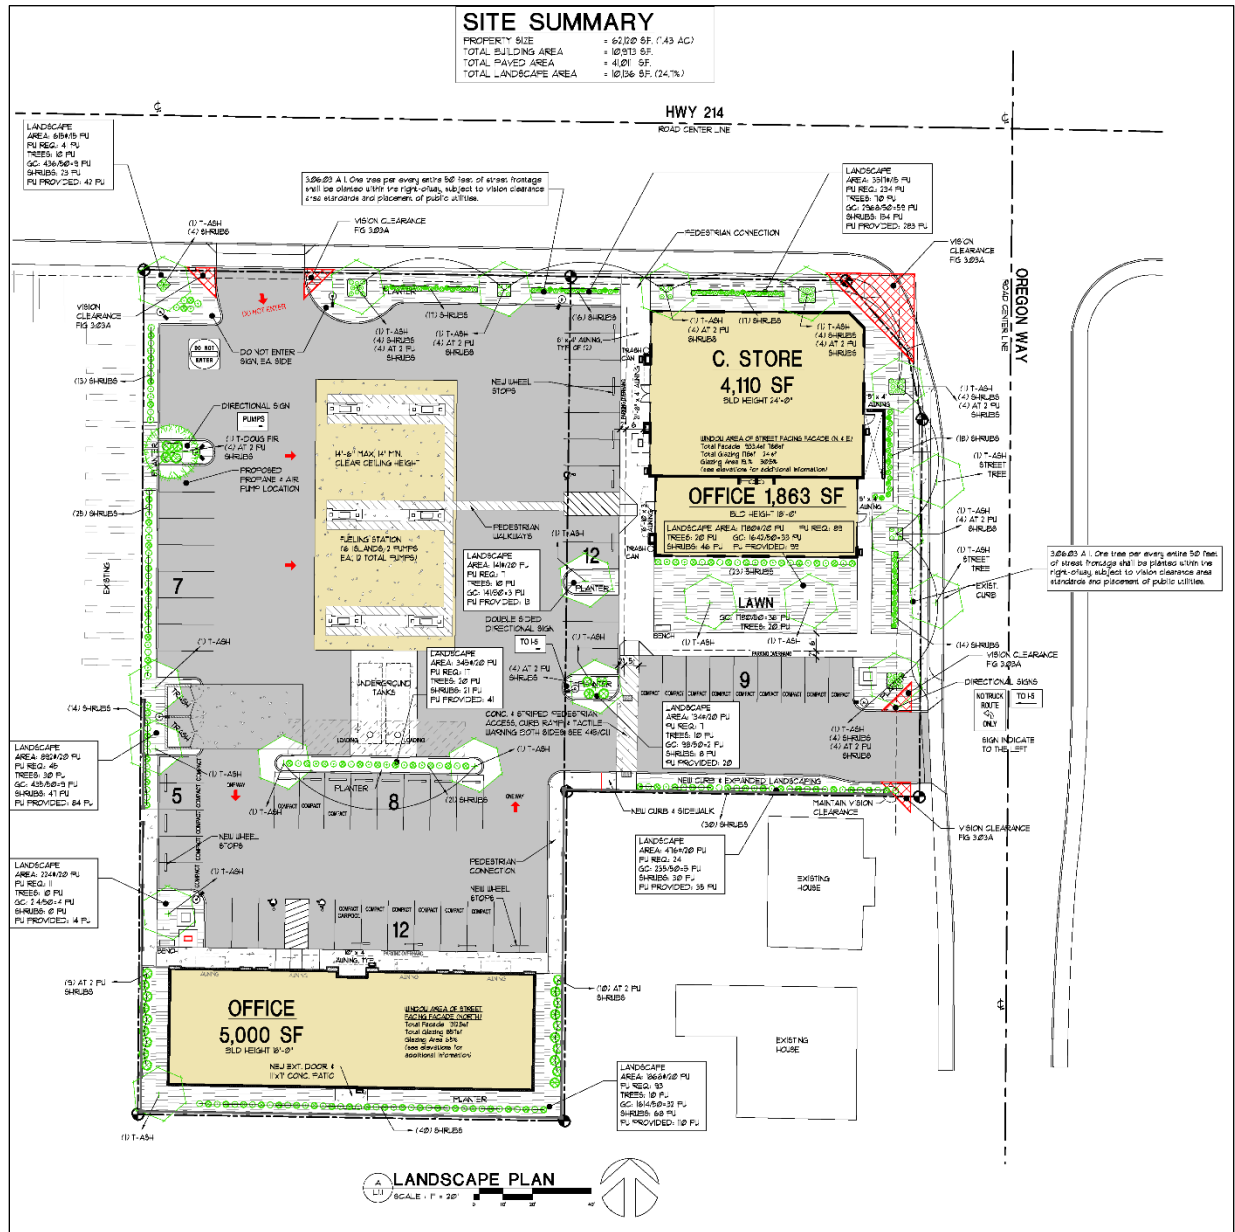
Landscape plan excerpt from Sheet L1.1 submitted February 8, 2024 and with building tan coloring by staff
